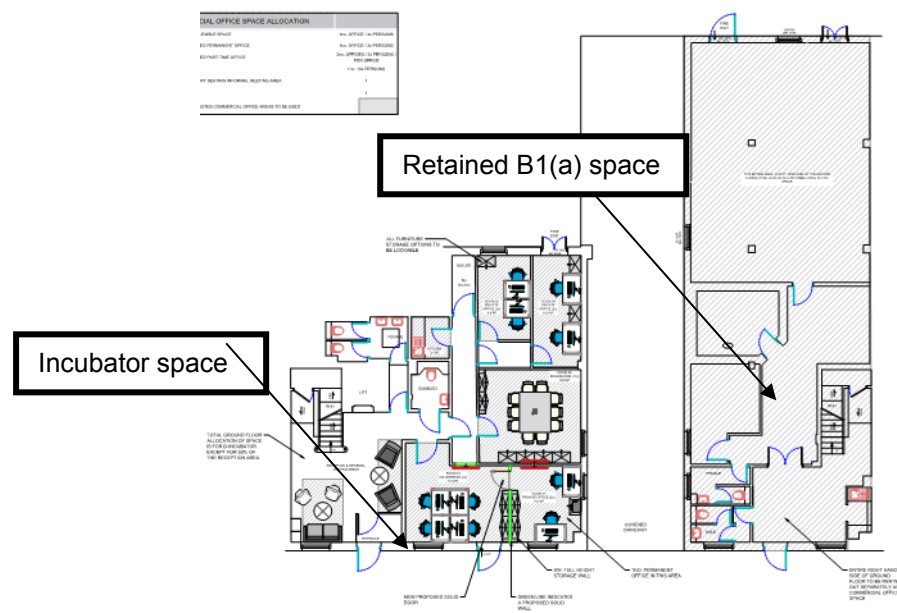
ground floor –proposed start-up space and retained office space (B1(a))
